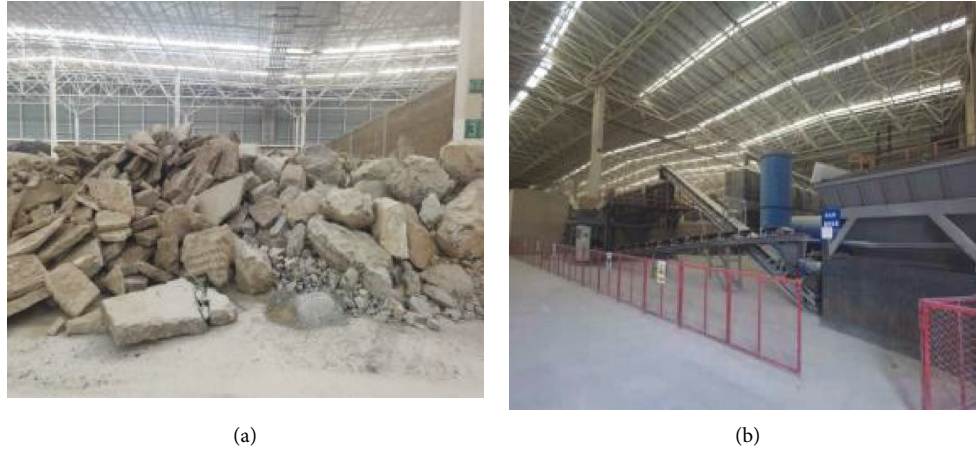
Construction waste and recycling equipment: (a) Construction waste and (b) recycling equipment.
